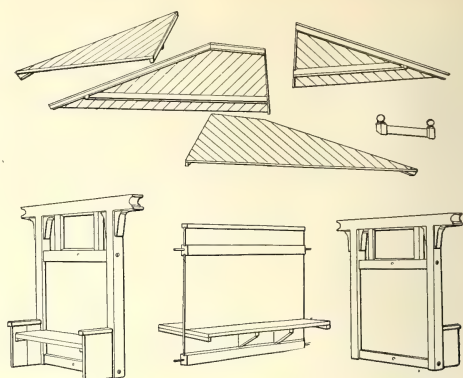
DETAILS OF NEW FRAME CONSTRUCTION PASSENGER SHELTER SHOWING CONSTRUCTION OF UNITS
